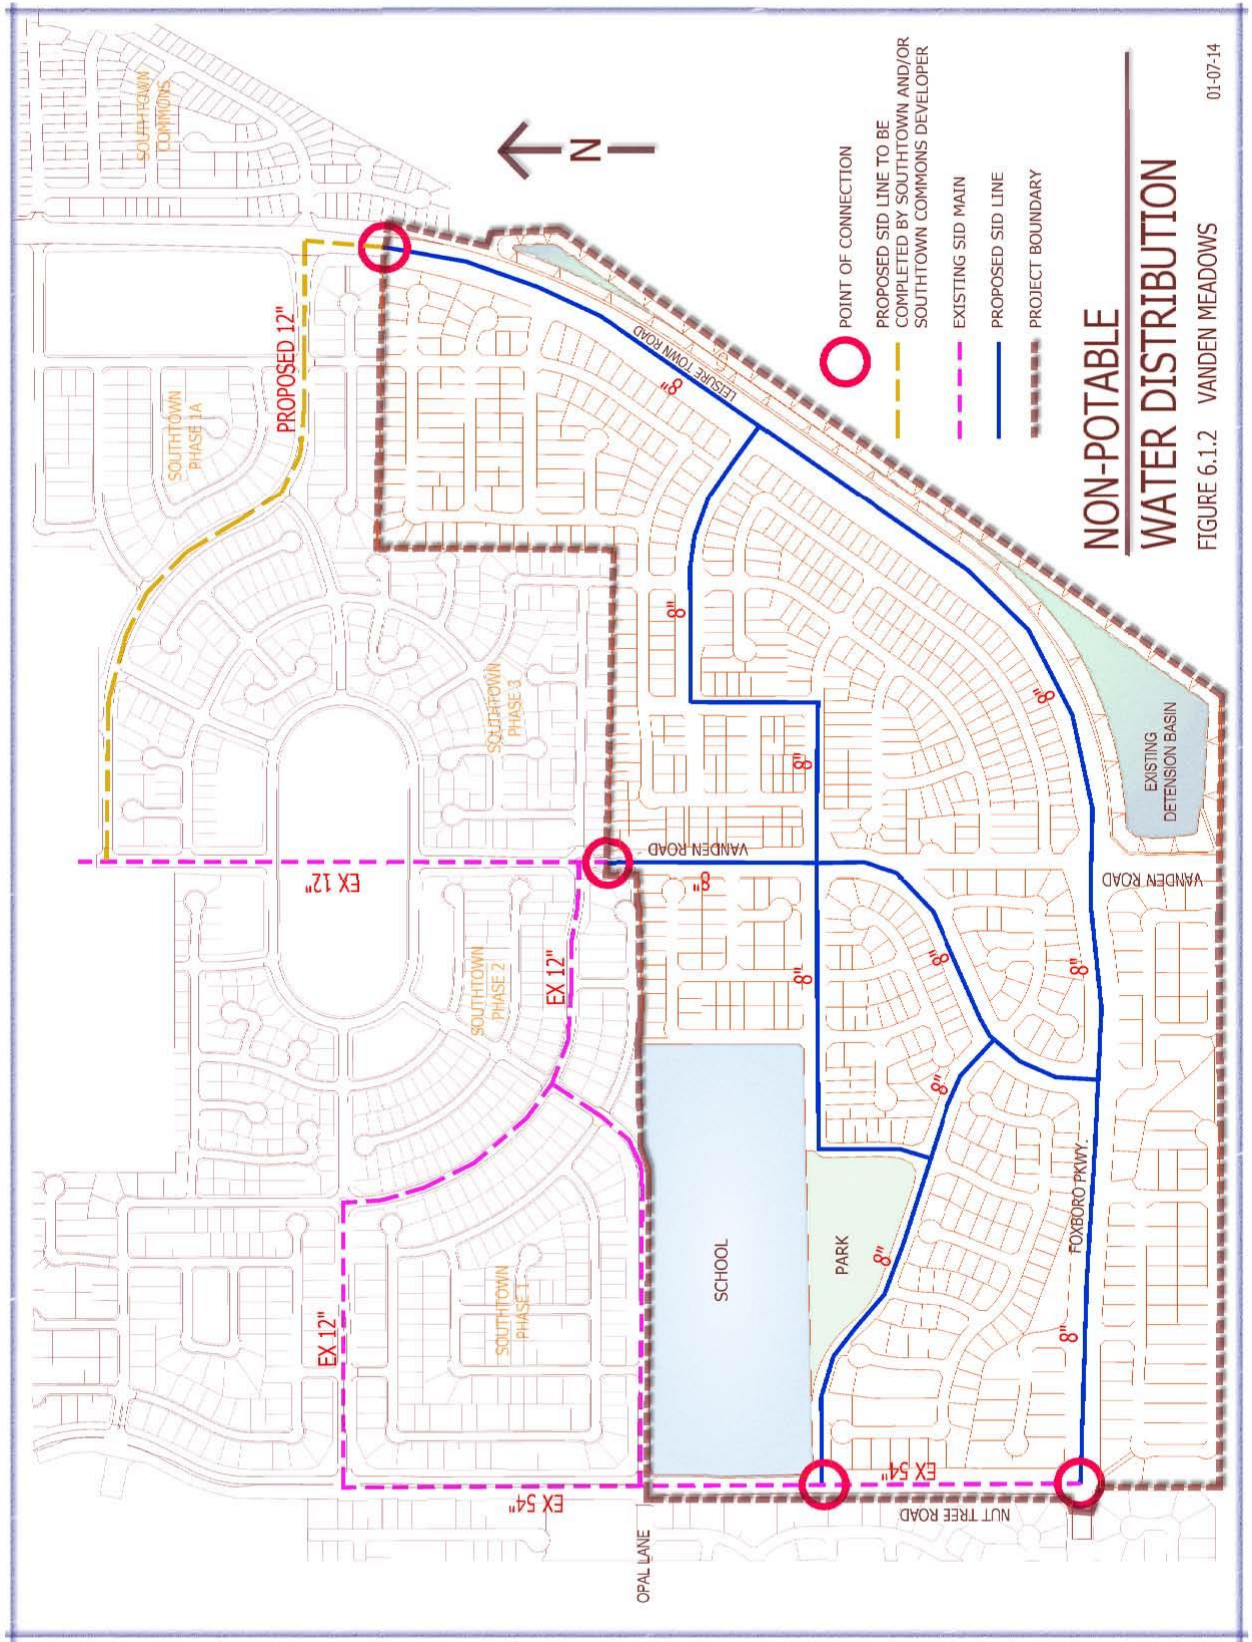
shows the Proposed Non Potable Water Distribution System Plan with existing and proposed water line sizes. In general, 8" water mains are to be located in all arterials and within Vanden Road creating a non-potable looped system with the South Vanden non-potable system. 6"-8" lines are to be located internally as necessary to serve their respective developments.
